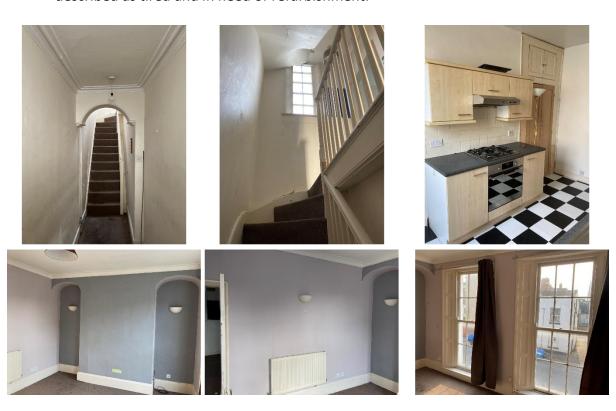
Interior of 2A Oxford Street – Ground floor hallway; ground floor staircase; first-floor kitchen; first floor front room (top left to bottom right)
